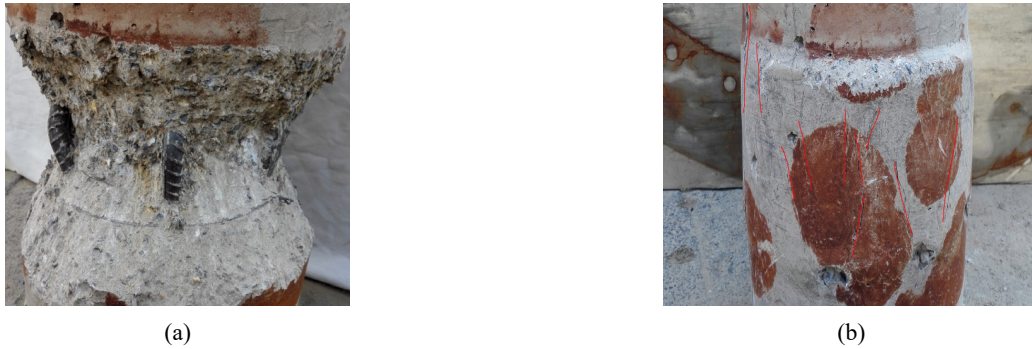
Typical damage modes of core RC column: (a) crushed concrete; and (b) cracked concrete
